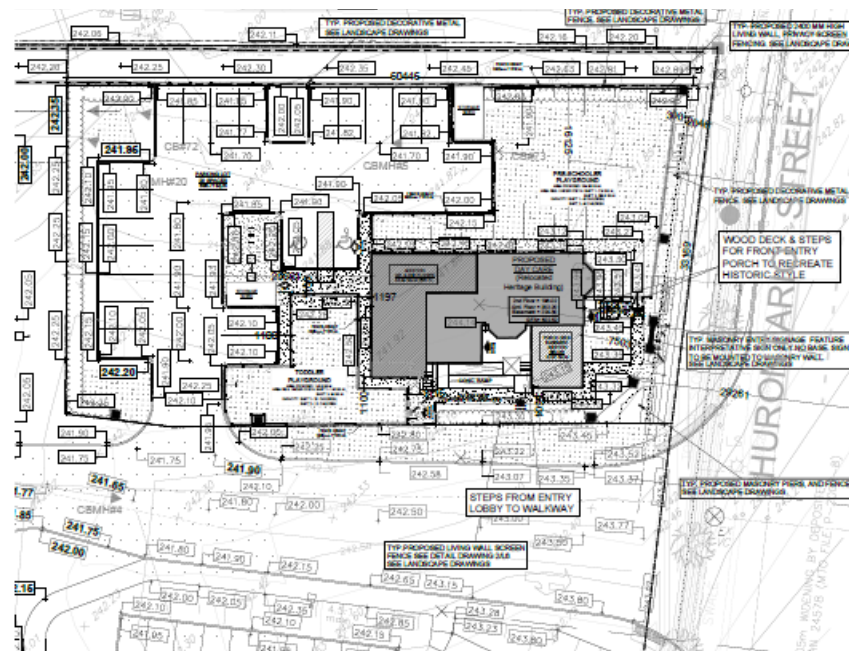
Site Plan, Phase 2 Armstrong House Daycare (AREA, Aug. 20, 2024)
